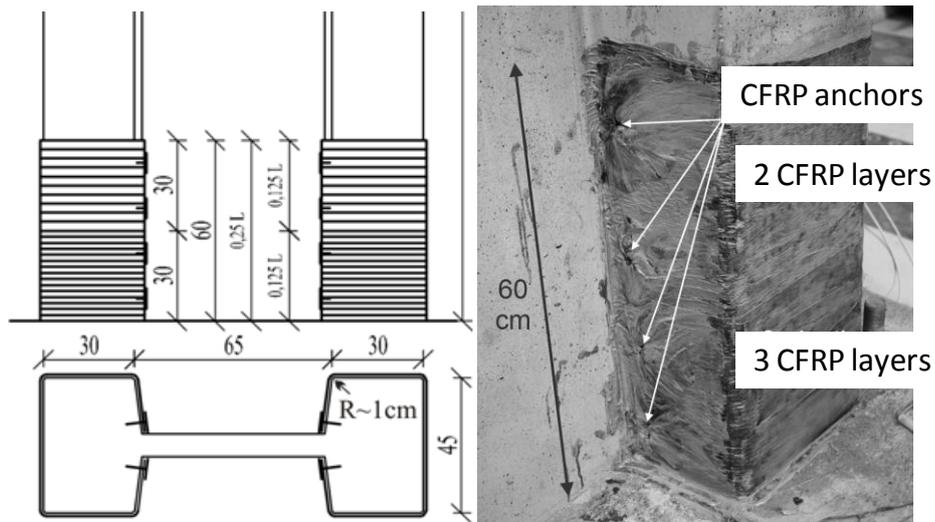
Seismic strengthening of the I shape column using CFRP strips attached to the columns using CFRP anchors
